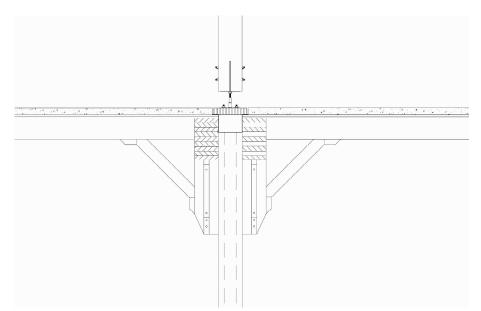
all operations together, new detail Gardenplatform construction 'AA. Connection platforms step 1 and 2.
